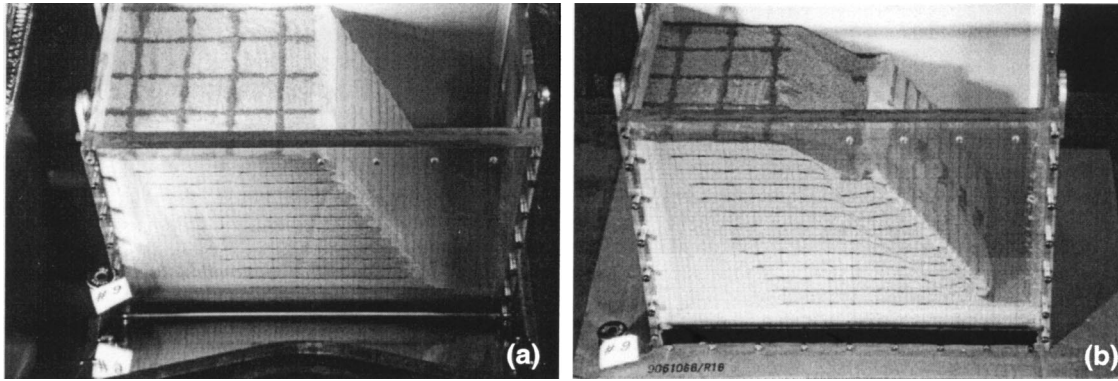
Reinforced slope model: (a) before testing in a geotechnical centrifuge and (b) after testing, showing development of failure surface
